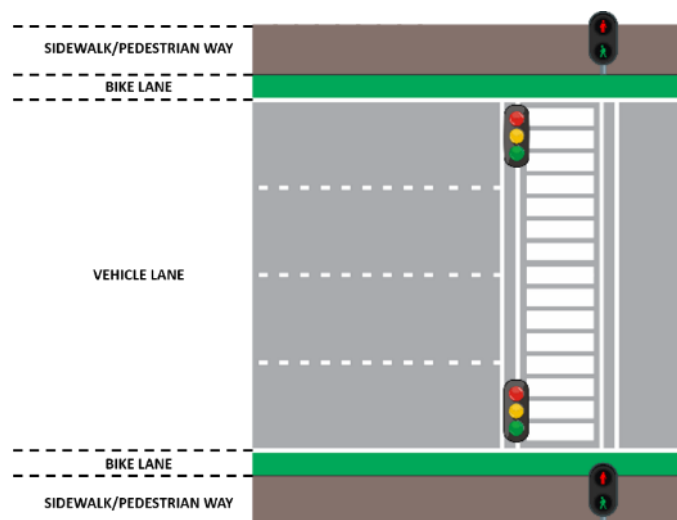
Crosswalk Lights Addition on Gubernur Suryo Street.
